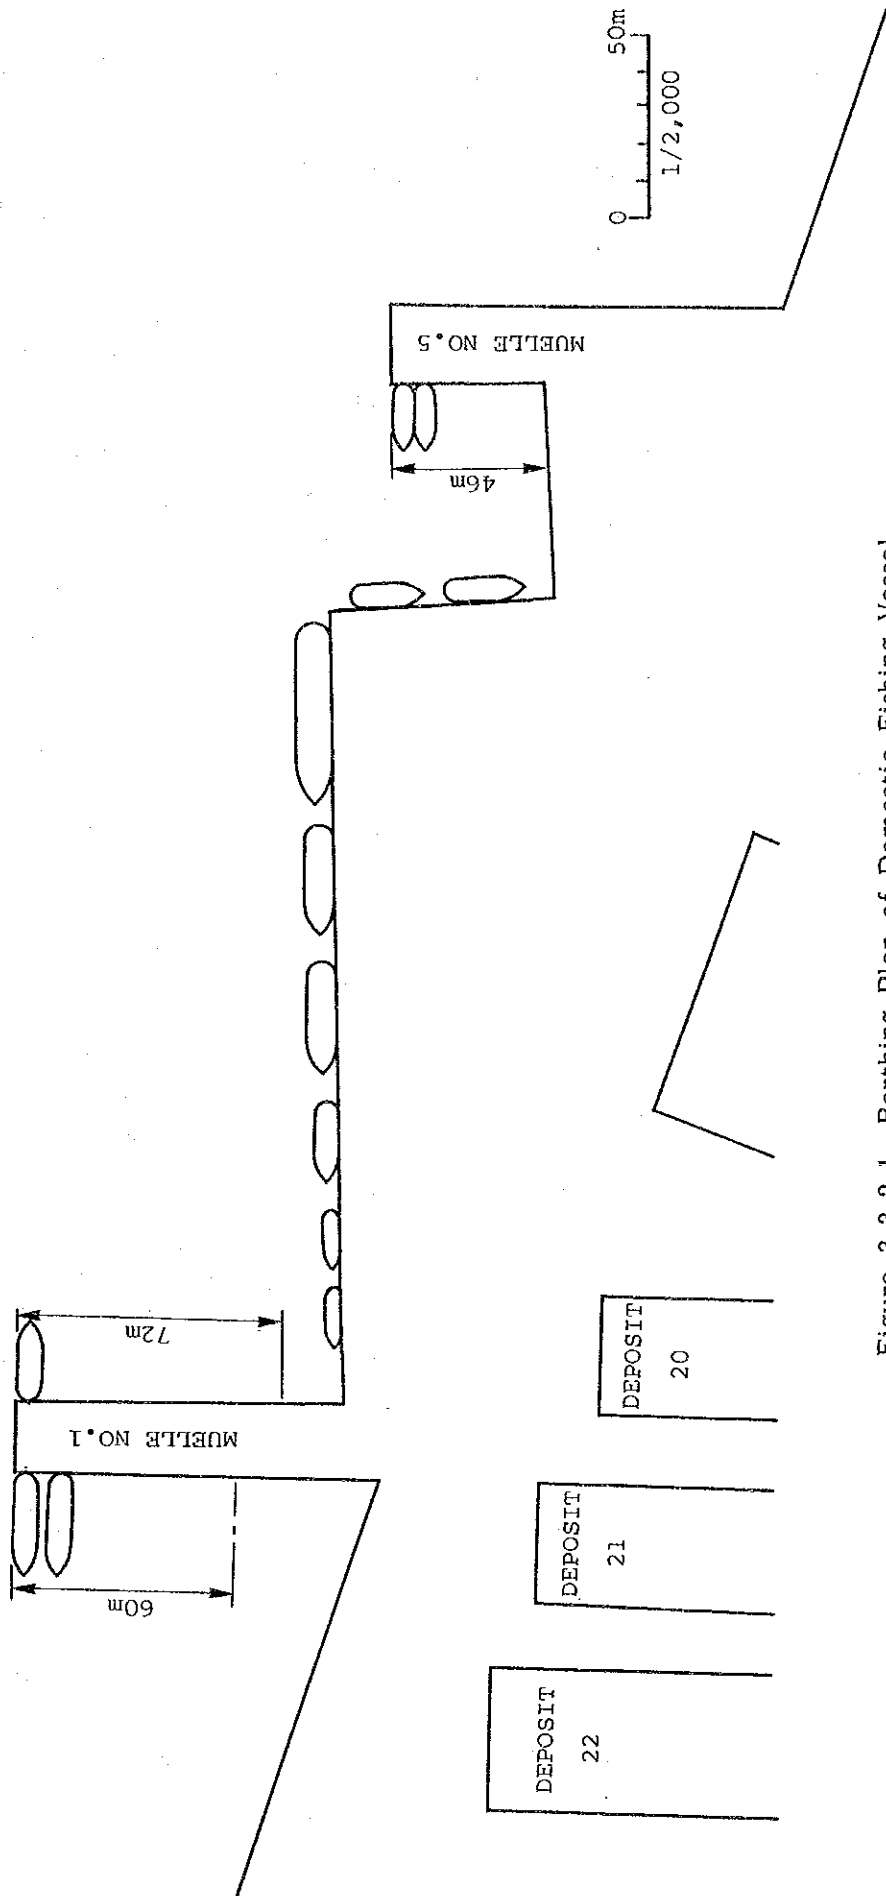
Berthing Plan of Domestic Fishing Vessel
